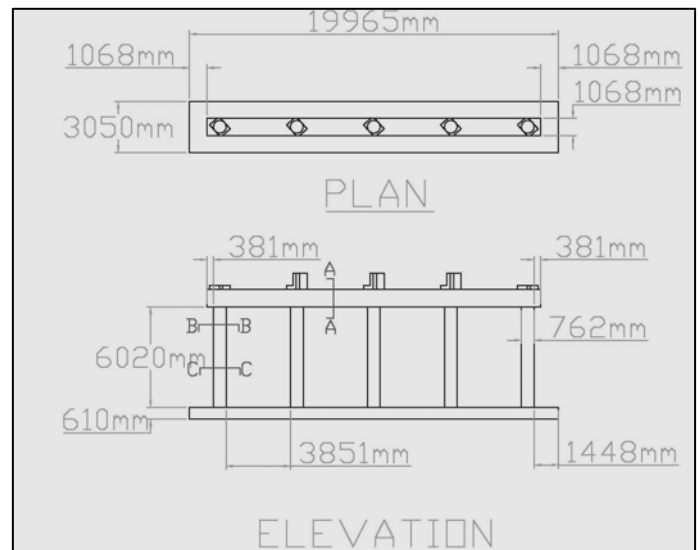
Details of Piers 1 and 3 in Bridge No. 5.
